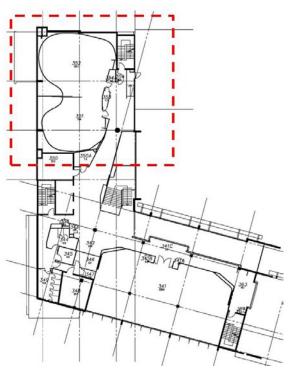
CTLC, Level 2 Floor Plan, Rooms 351 & 352 Architects: Wilson Architects Source: Wilson Architects
